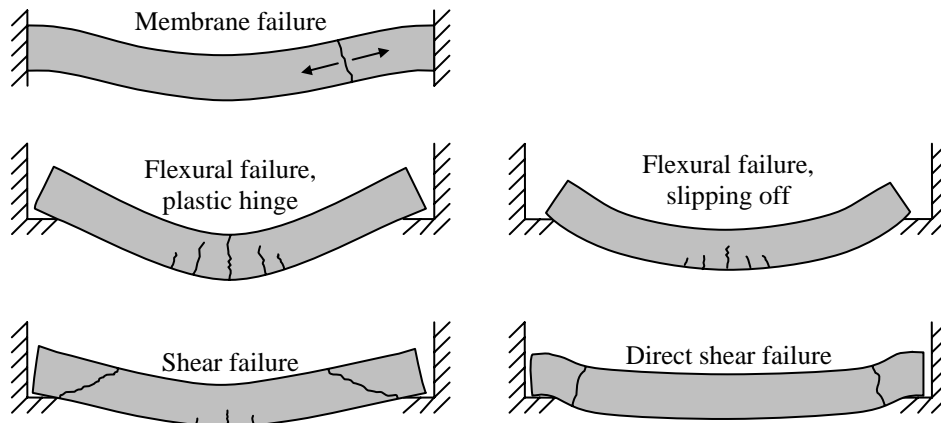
Global damage of reinforced concrete beam.
